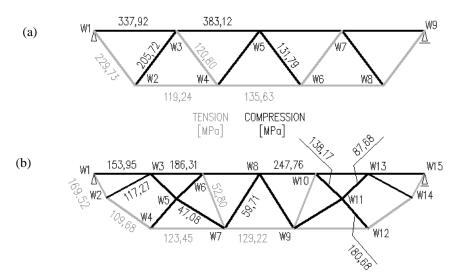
Stresses [MPa] in frame structure A (a) and B1 (b) for cross section wall sheet gauge of 20 mm
